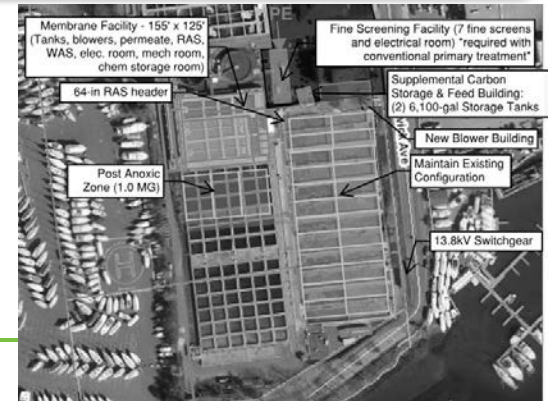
ZeeLung installation concept at Bridgeport WWTP West Plant
